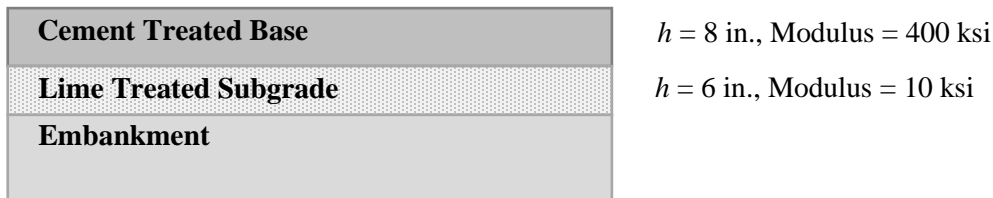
Pavement Structure and Design Parameters for FM 133 in Dimmit County.
